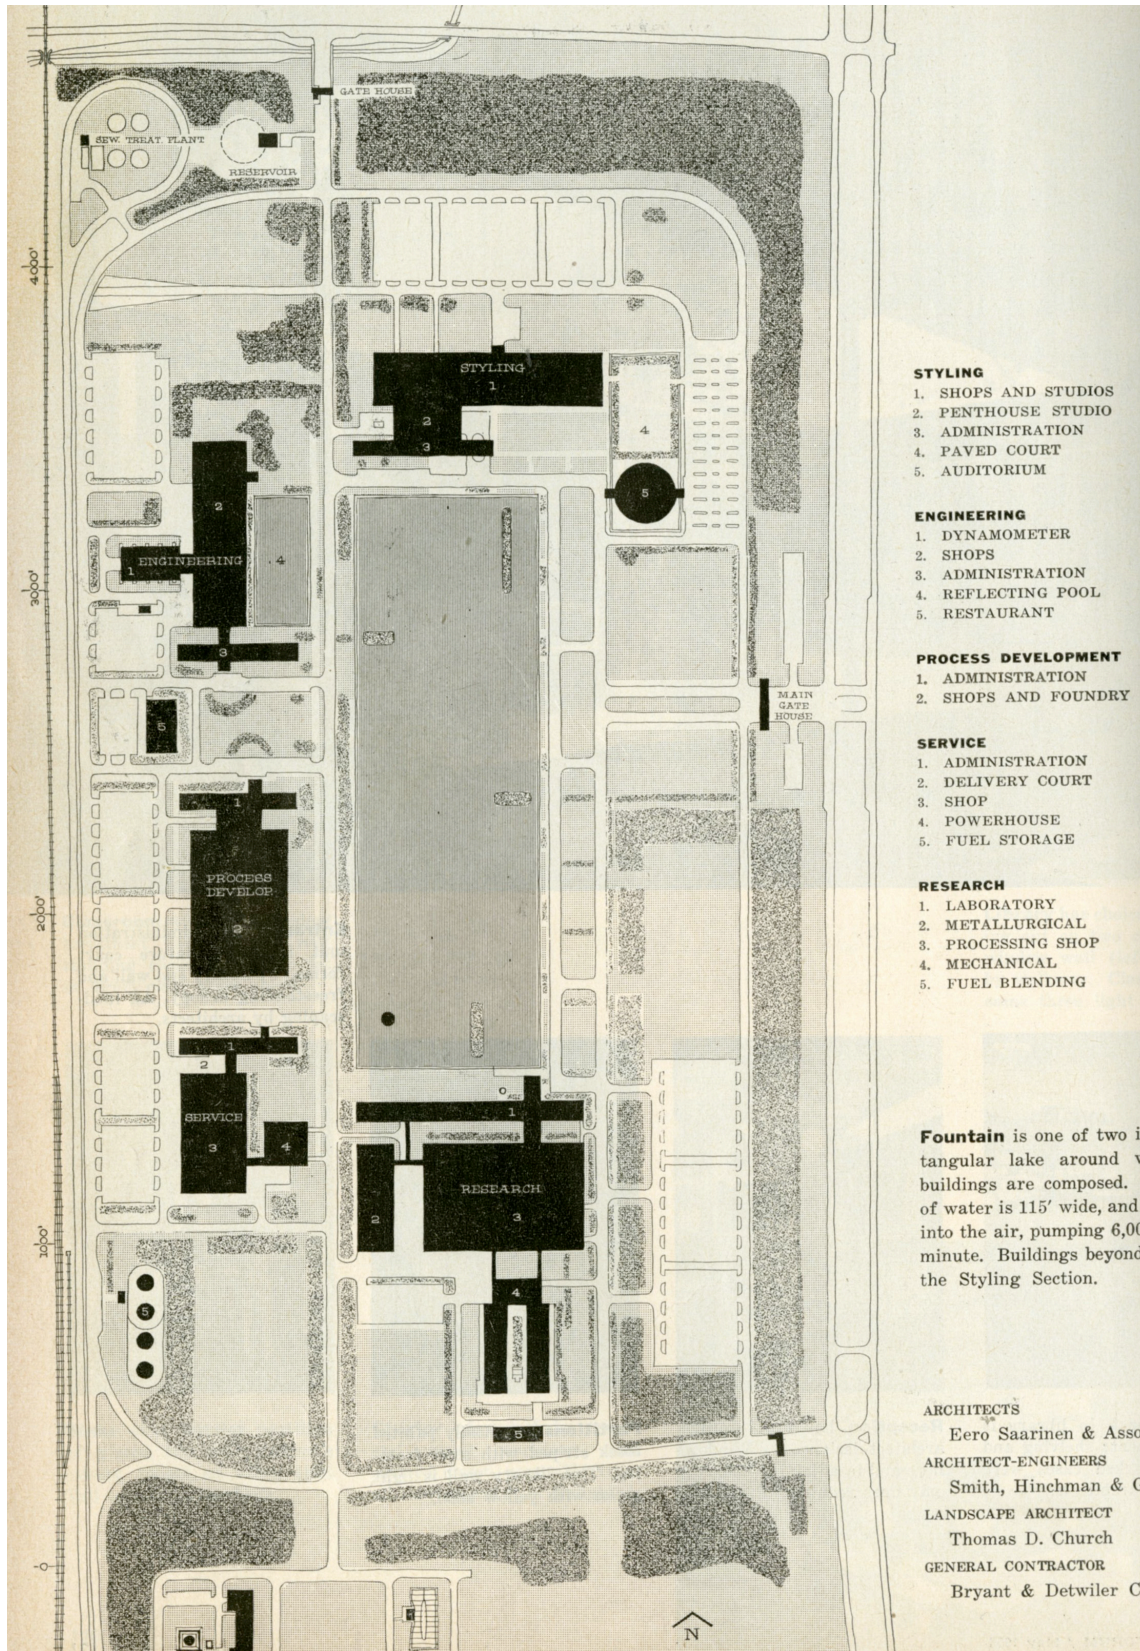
GM Technical Center Site Plan: Source: Architectural Forum, May 1956.
